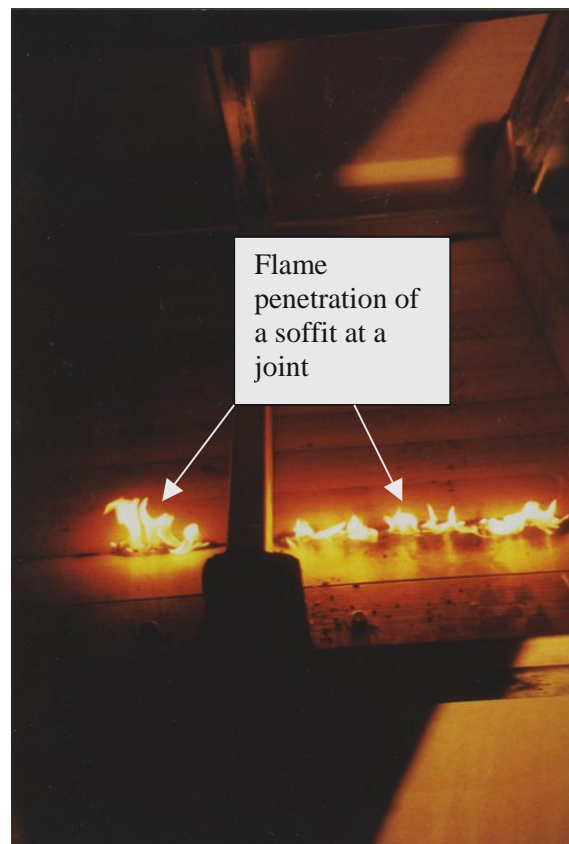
Flame penetration occurred through a T&G joint in a soffit constructed with nominal 1-inch (25 mm) boards. This view is from the interior of the attic/soffit area.
